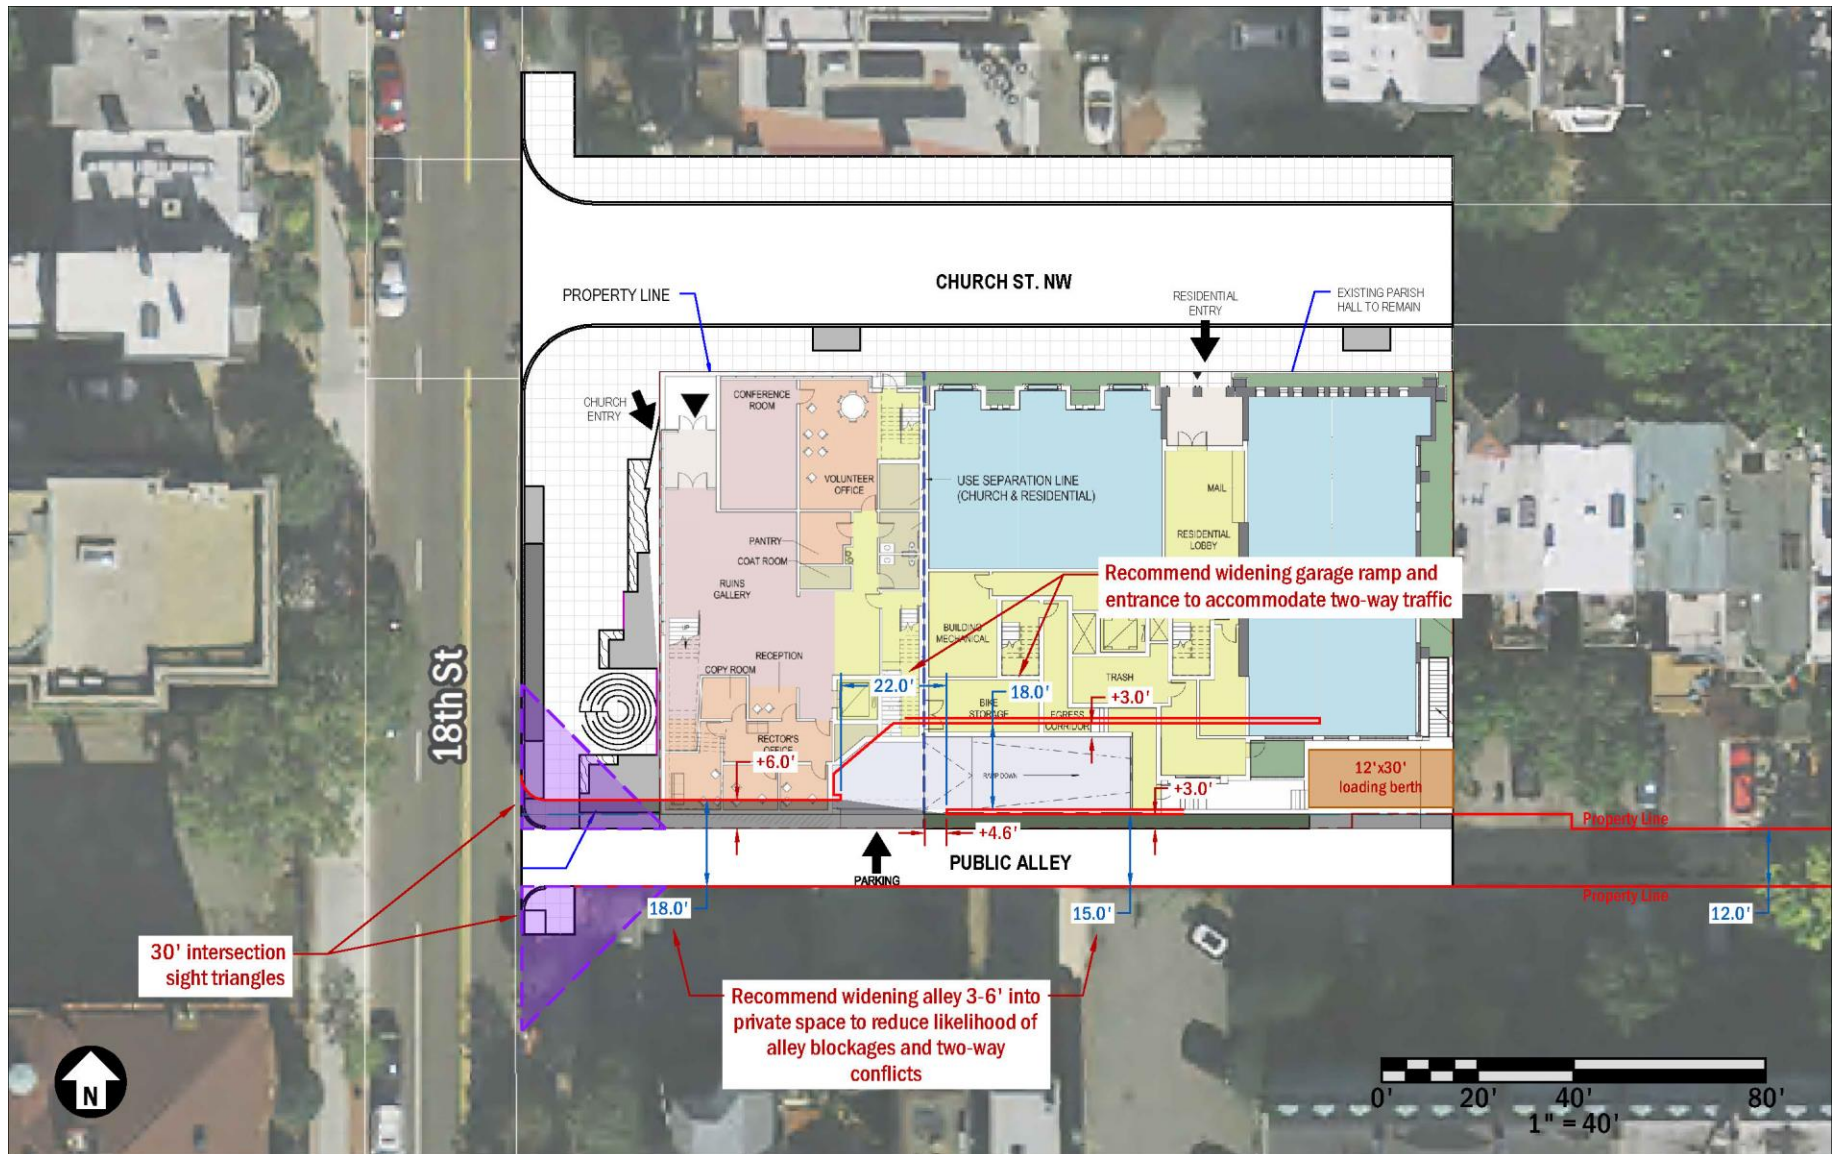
Annotated Site Plan Showing Recommended Modifications to BZA Plans to Improve Garage Access and Alley Traffic Flow
